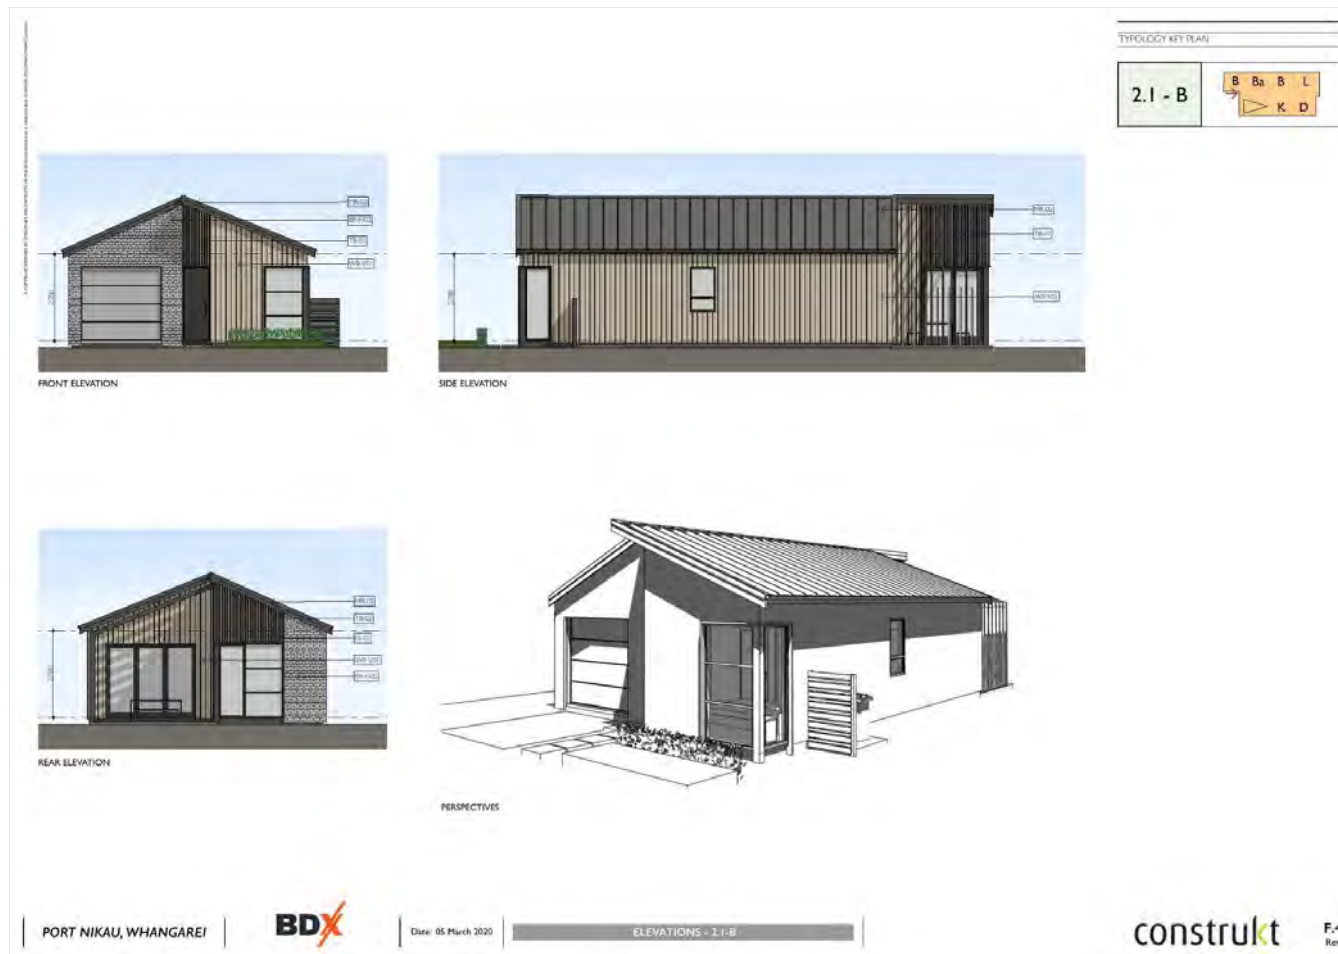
PDNA 1. Part F – Typology Plans and Elevations
